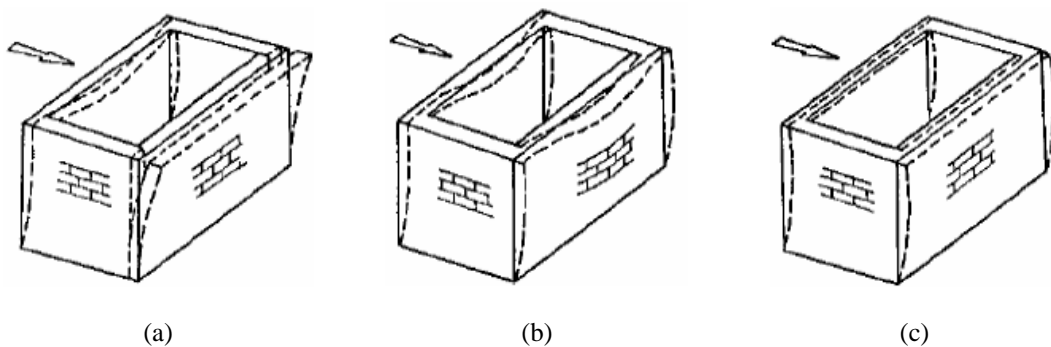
Typical seismic behaviour: (a) Flexible floor and weak connection between orthogonal walls; (b) Flexible floor and good connection between orthogonal walls; (c) Rigid floor and good connection between orthogonal walls (Tomažević 1999).
